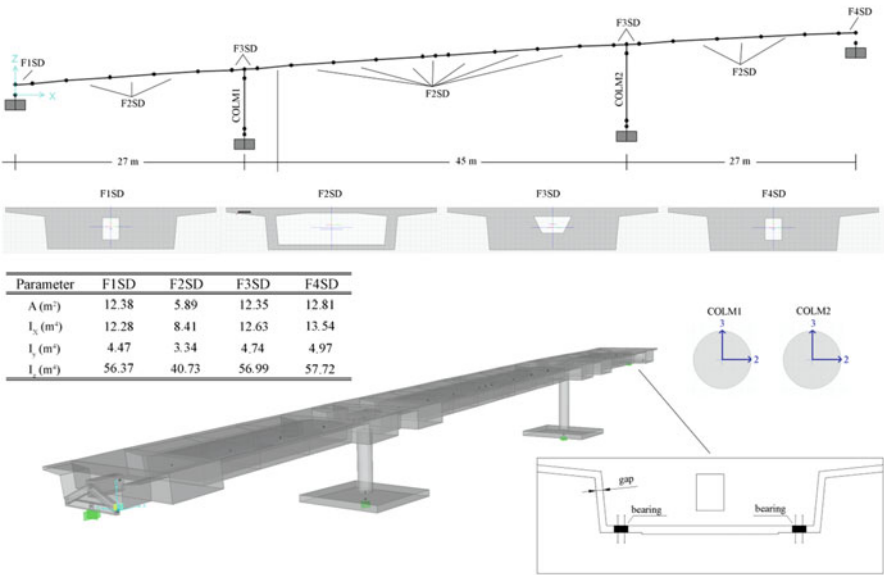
Layout of the bridge configuration and finite element modelling
